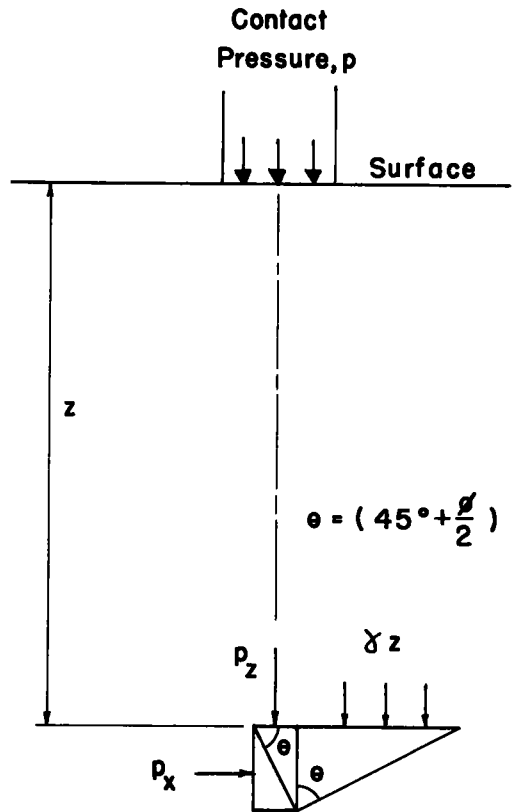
Stresses on an element of flexible pavement below a wheel load.
